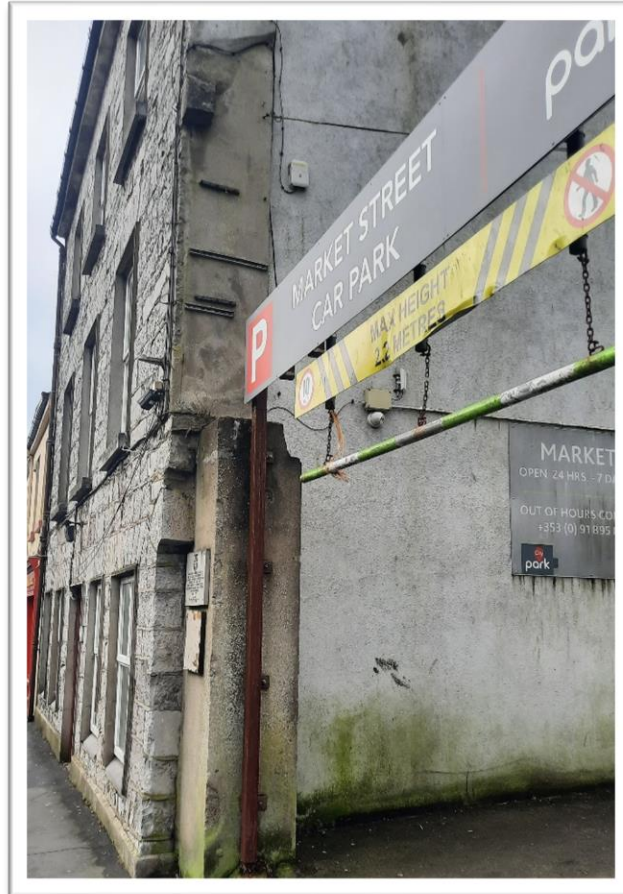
Undulating external wall surface at the front wall and gable junction. Raised level of footpath in comparison to the internal floor level
